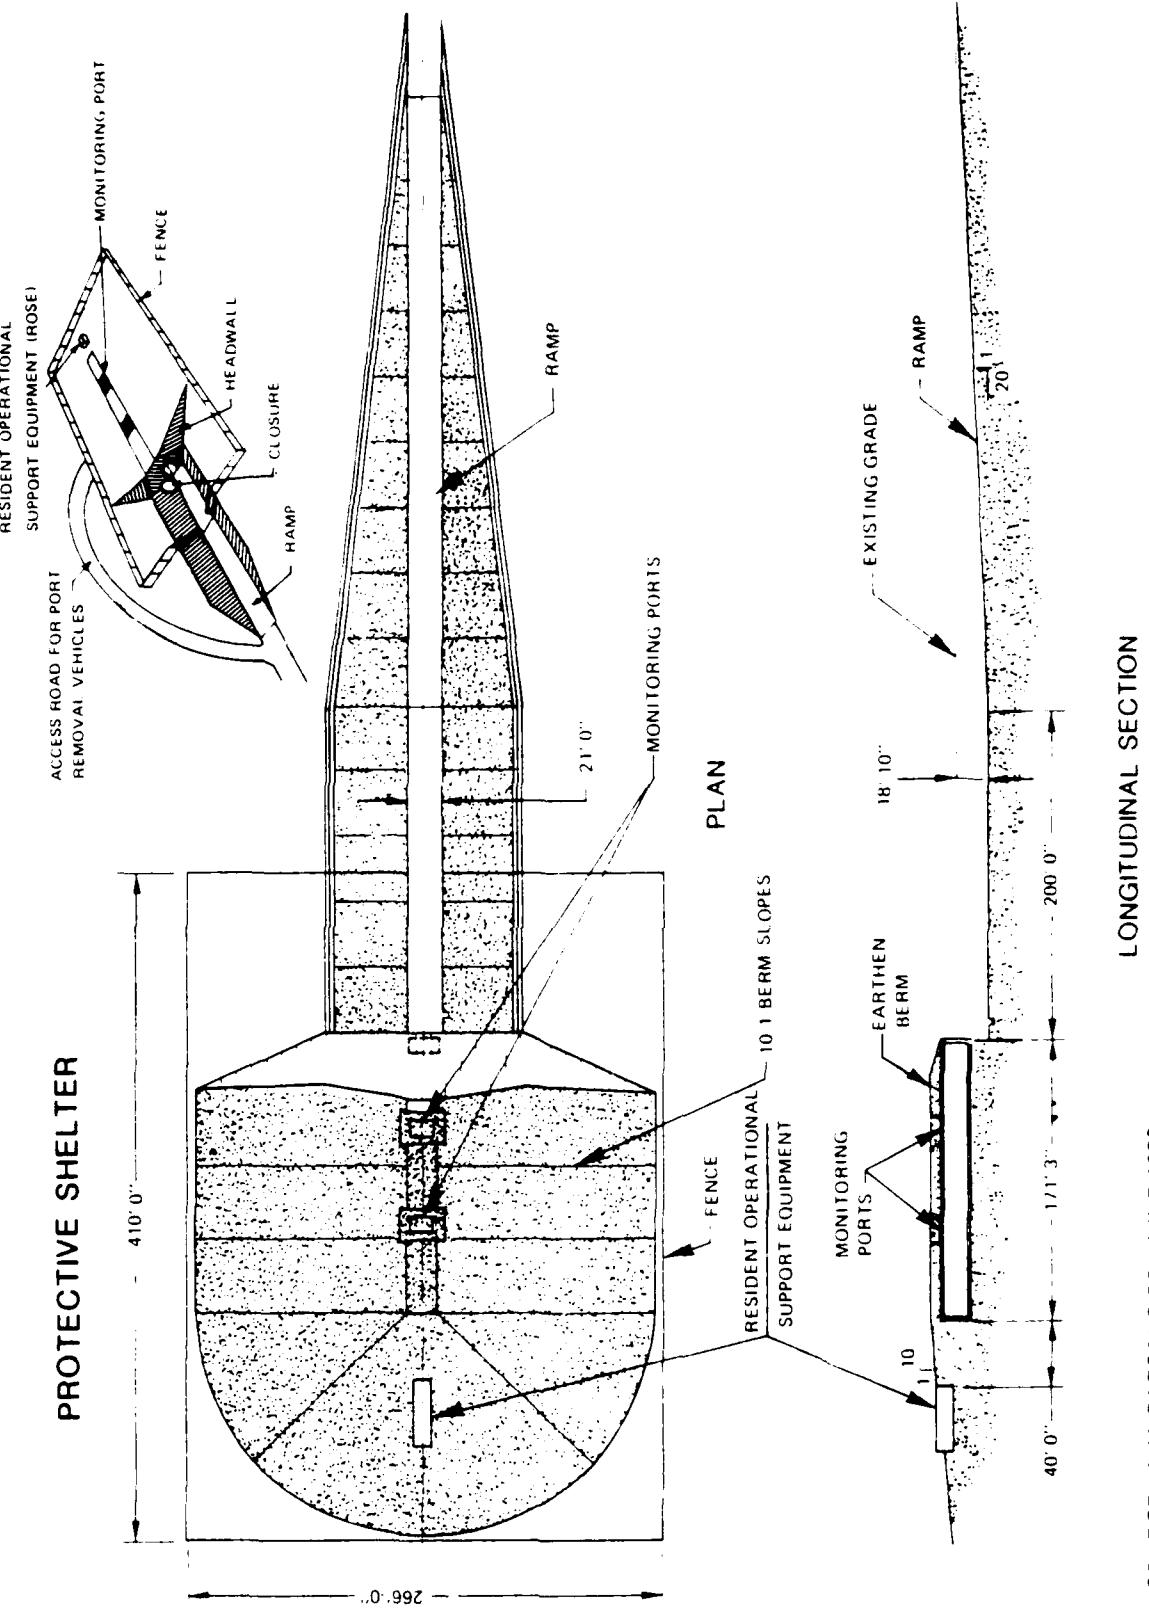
Protective shelter configuration, plan, and longitudinal section.
